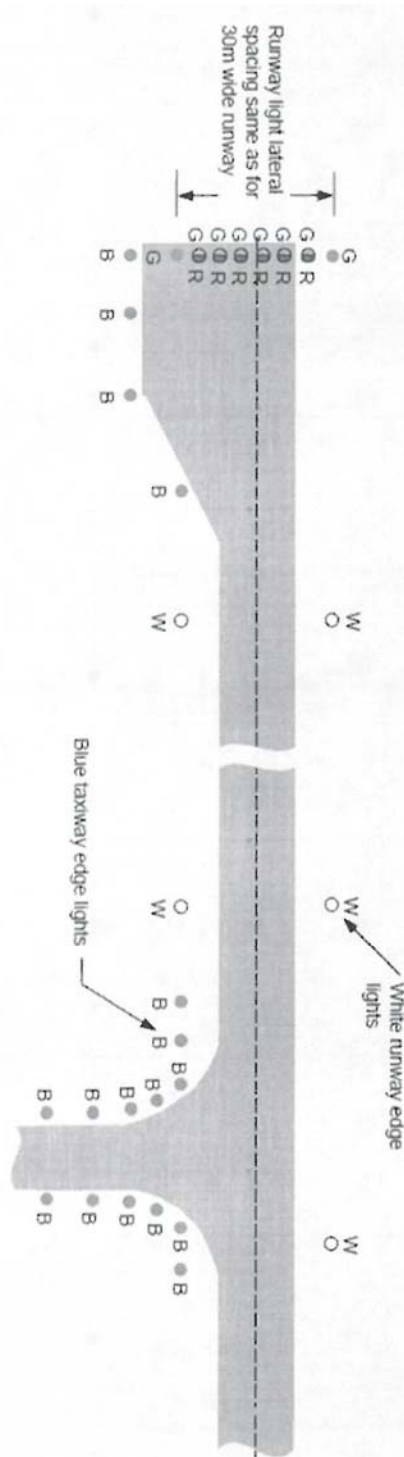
Typical Light Layout Where Runway Pavement is 23 m or 18 m wide
